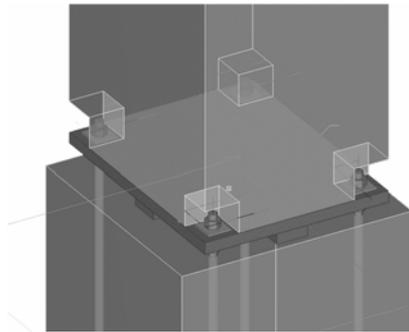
A column-to-column splice with anchor bolts connection (C-C-AB)
